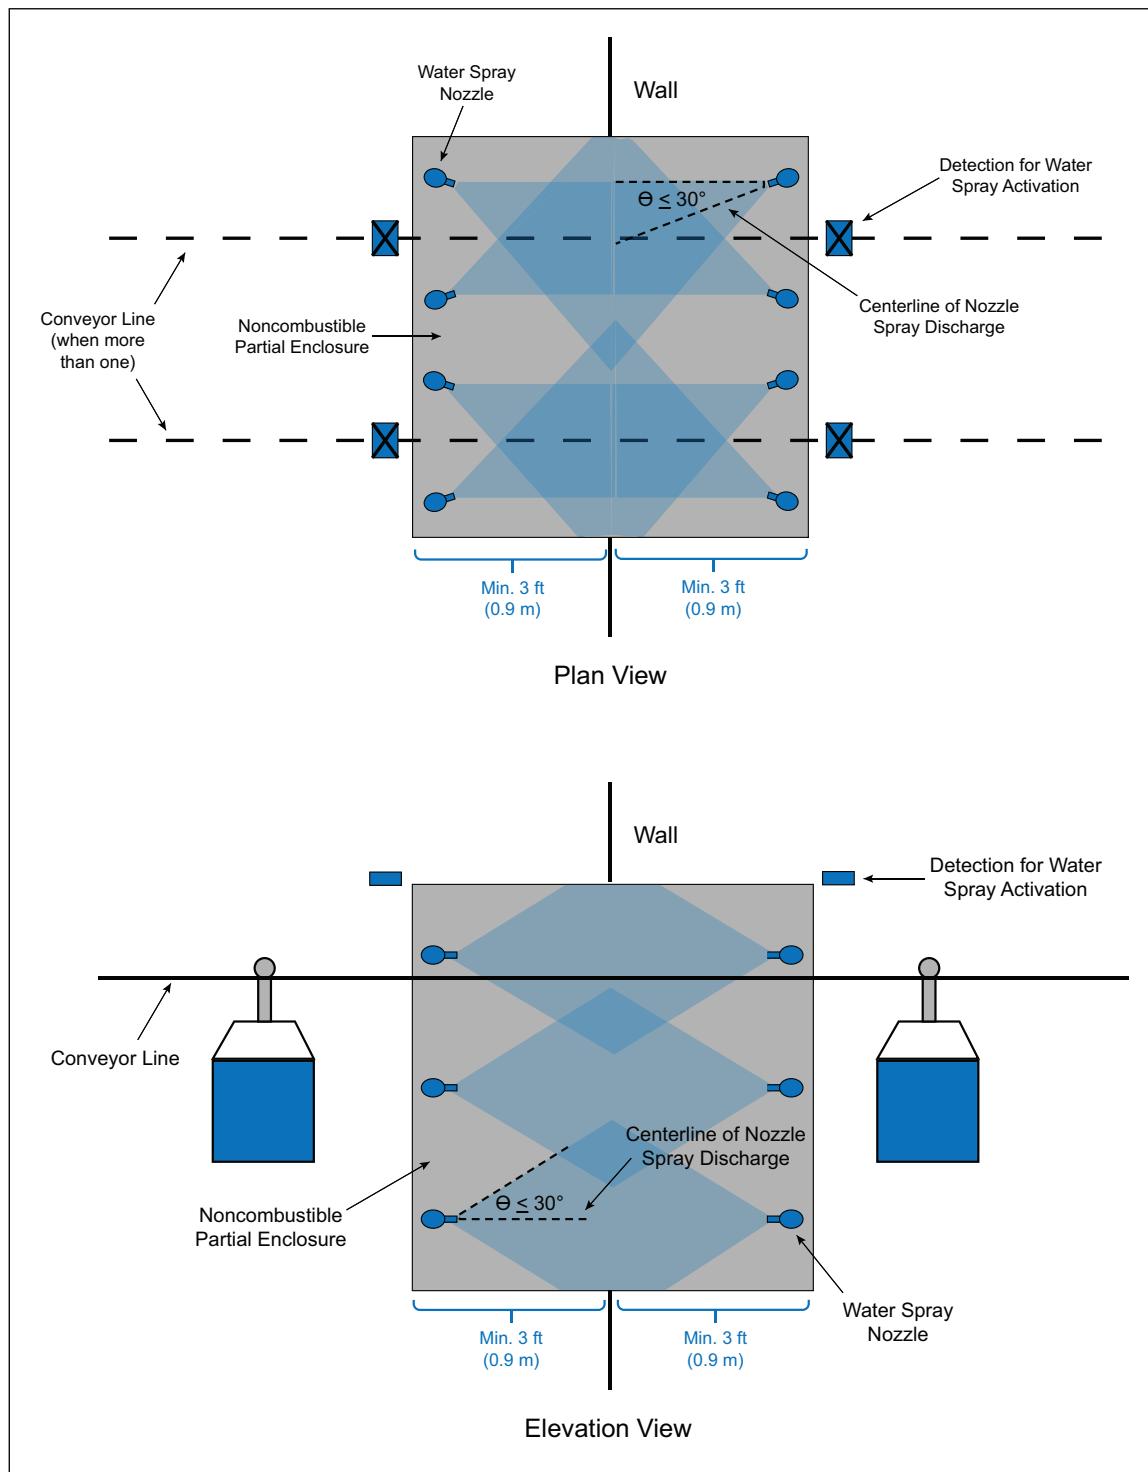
Protection of conveyor opening in a wall with flow of material handling through the opening in both directions
